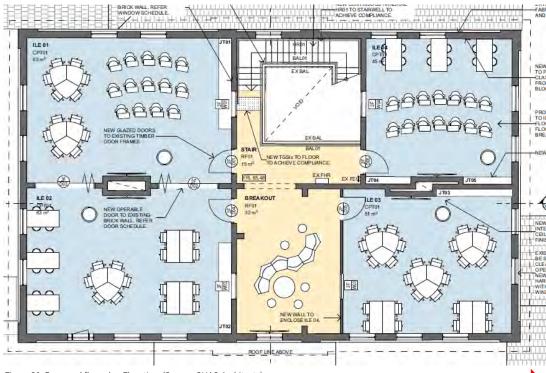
Proposed floor plan Elevation. (Source: SHAC Architects)
